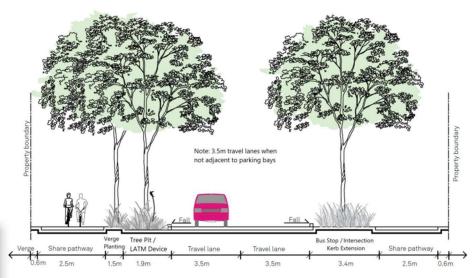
Collector Road LATM, Tree Pit, Bus Stop or Kerb Extension Details
